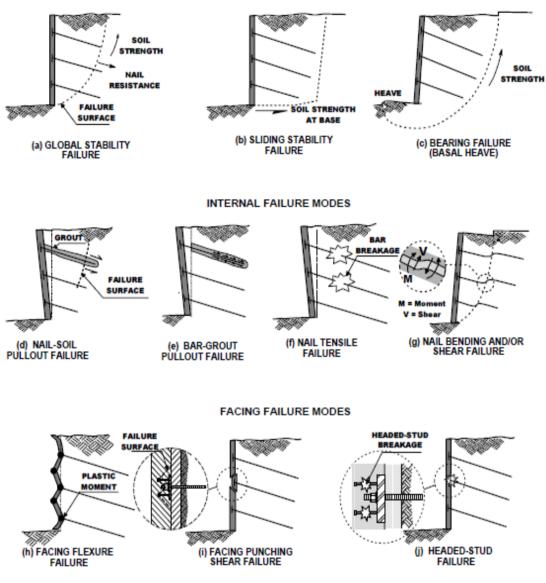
Principle Mode of Failure of Soil Nail Wall (modified after Clouterre, 1991)
